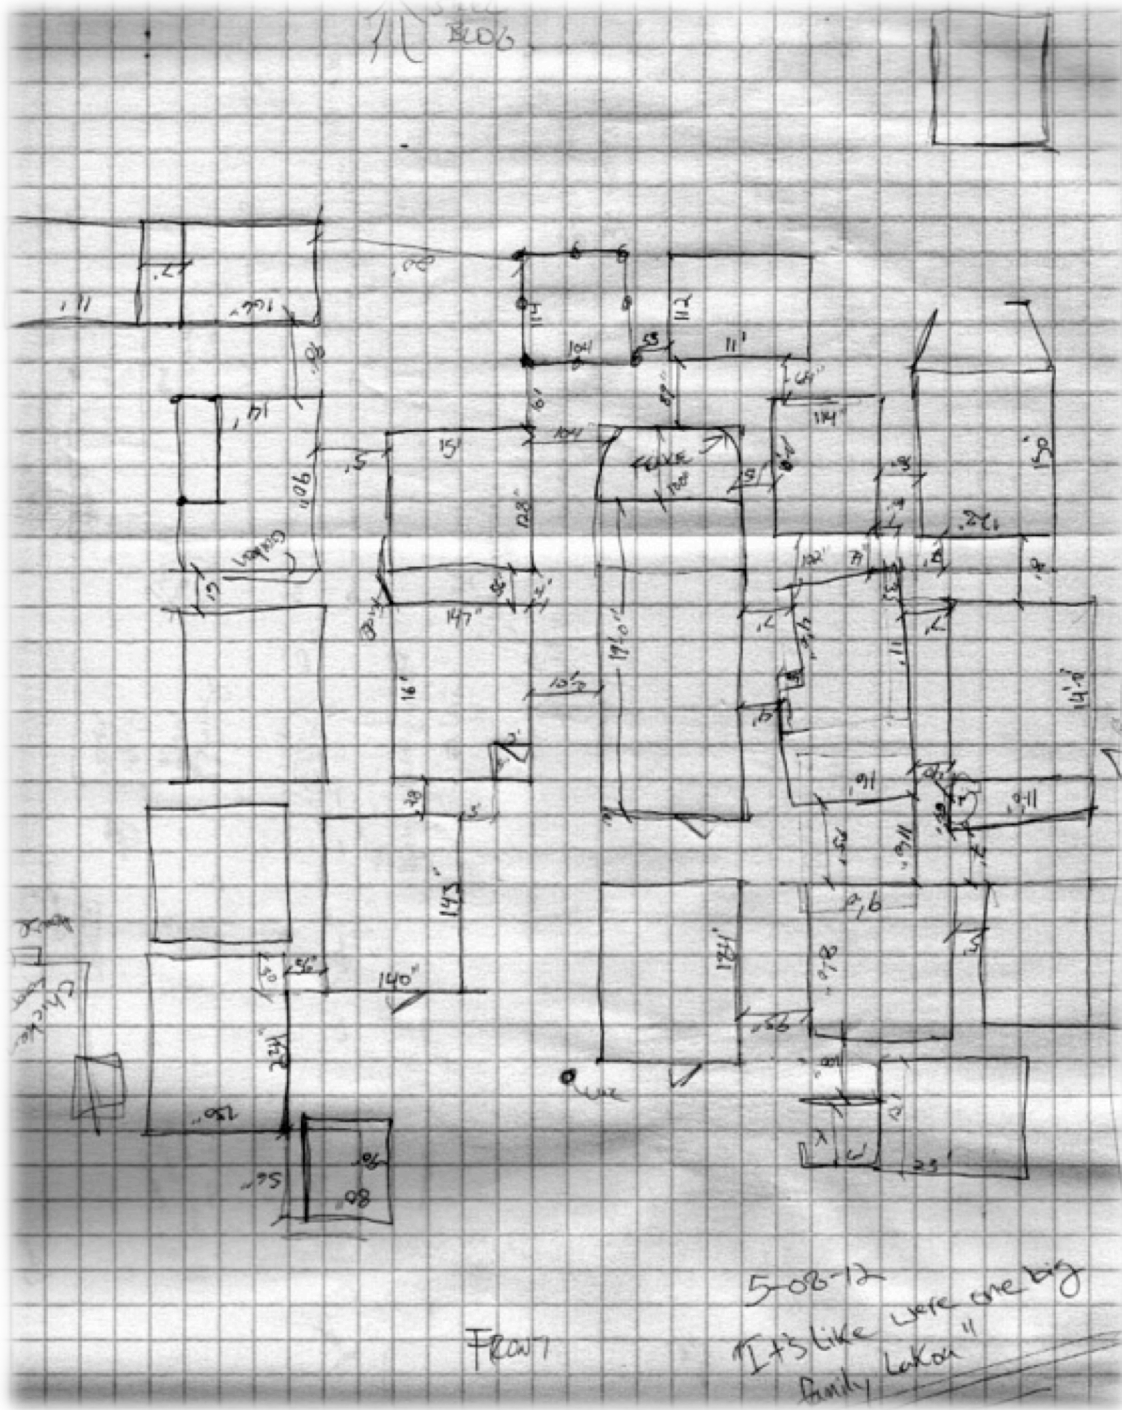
Partial site plan sketch of Sugar Canaan. 5/08/2012
